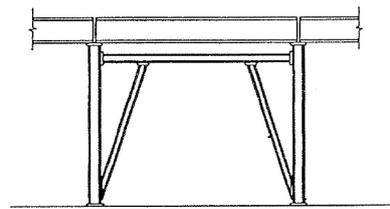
Vertical Bracing for Heavy Cranes
